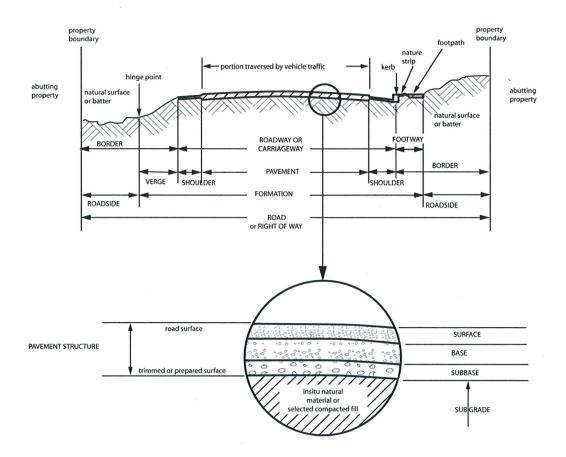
Pavement Structure Formation (Source: Austroads Guide to Pavement Technology Part 1: Introduction to Pavement Technology)
